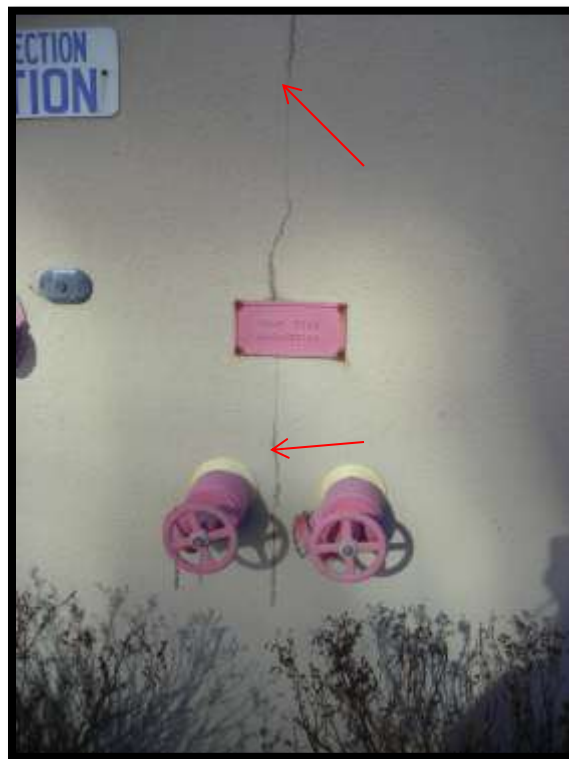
Hairline crack in CMU block wall (North elevation).
